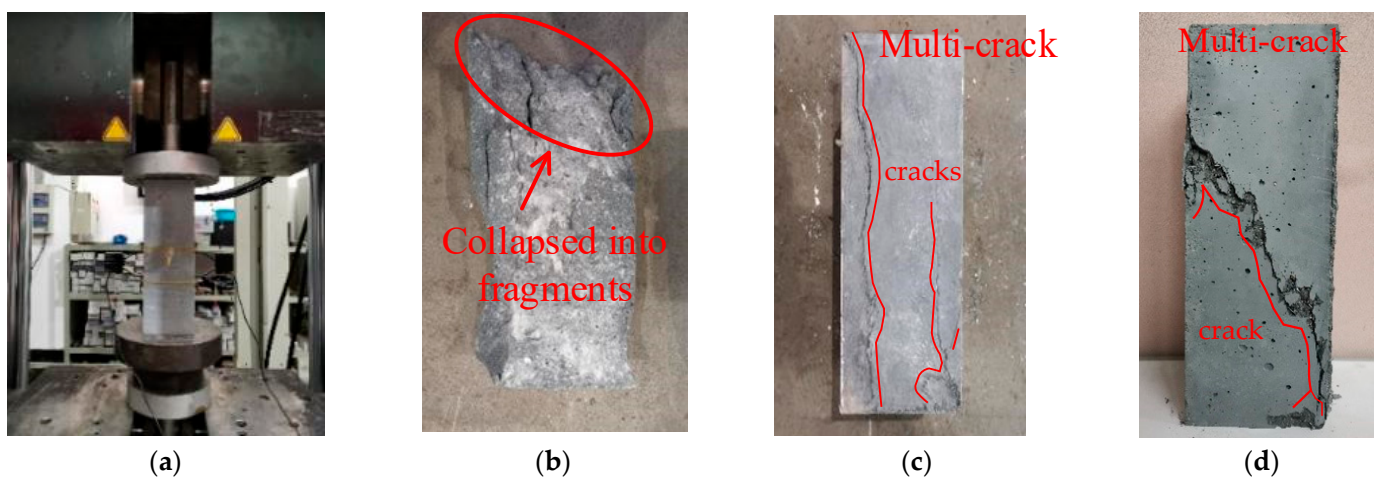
Test setup and failure models of specimens. (a) INSTRON-8805. (b) Specimen: H0. (c) Specimen: H15-S. (d) Specimen: H15-H.
